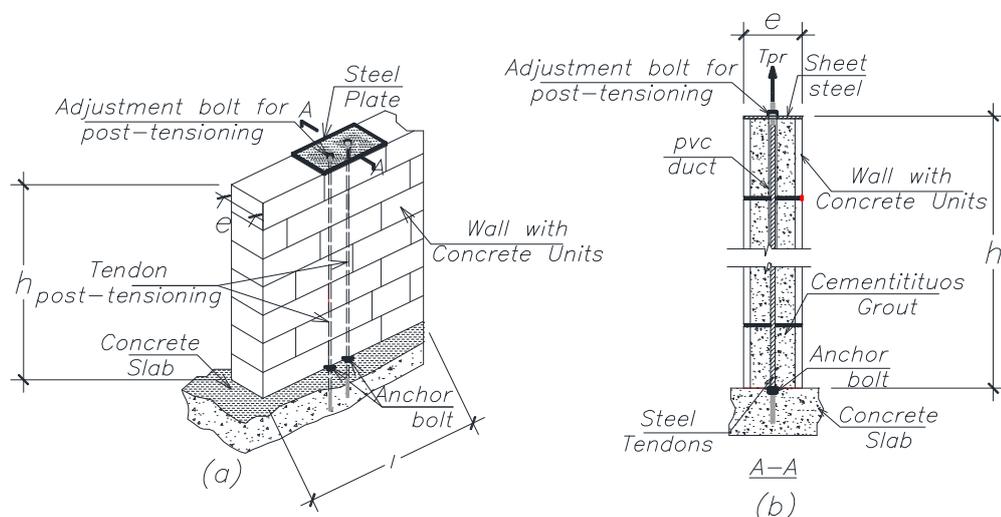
Configuration of the post-tensioned wall with concrete units
